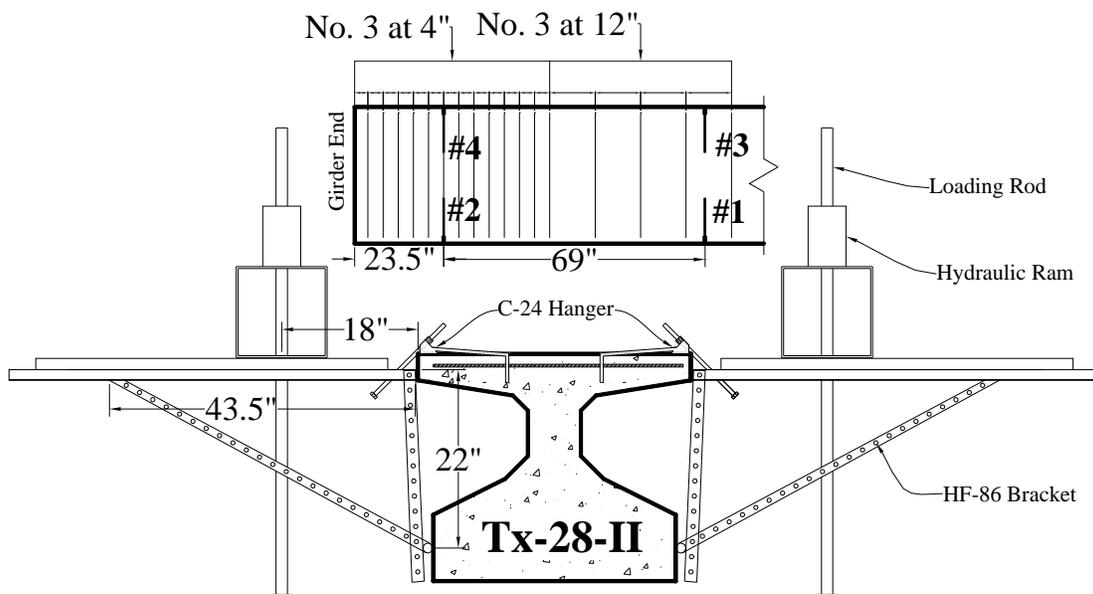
Reinforcement pattern and loading geometry for C-24 on Tx-28-II
